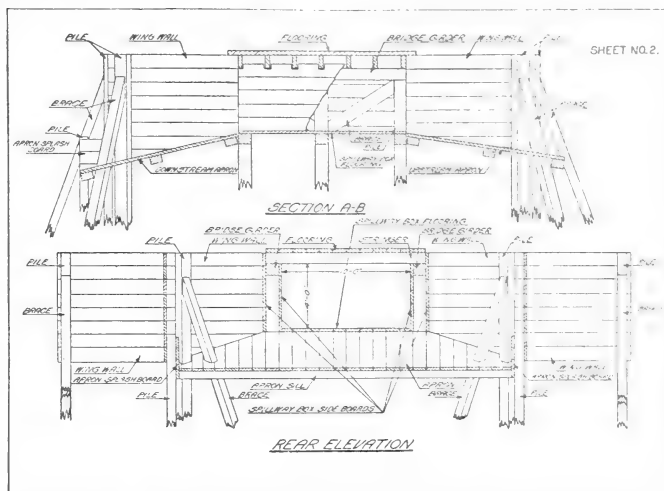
Plan of Ilecla Dam, Bayou Walnut, Mound, La., 1915.
